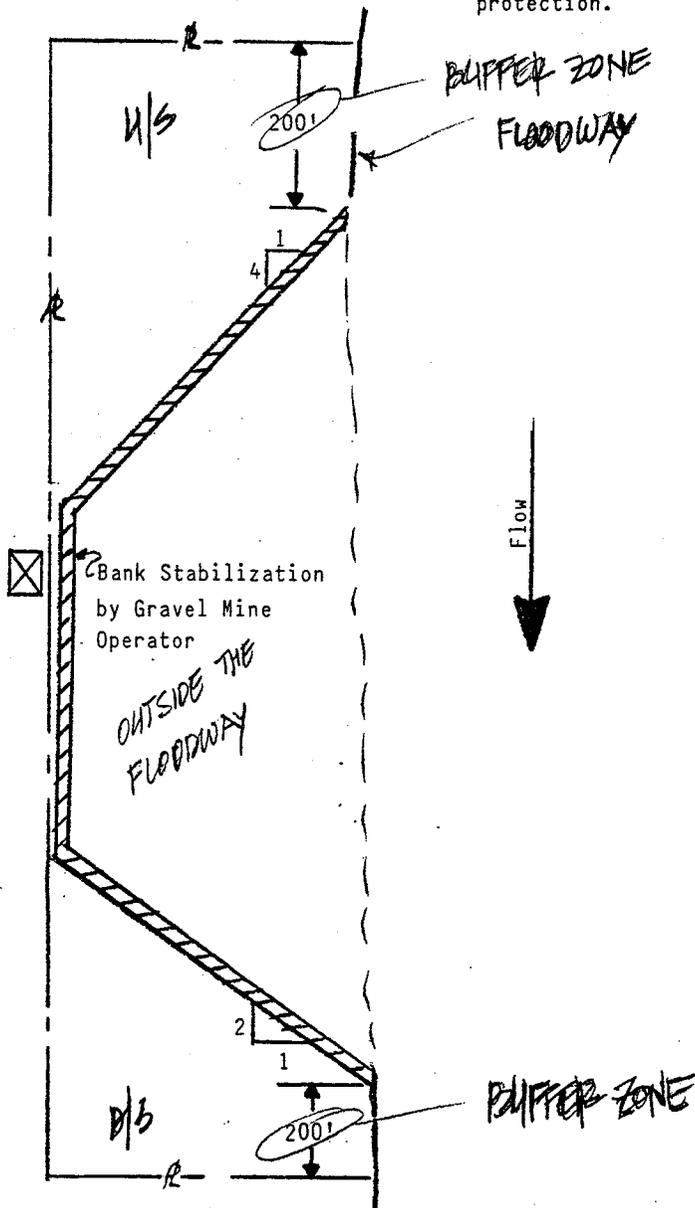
Limit of Excavations Downstream of a Hydraulic Structure.
